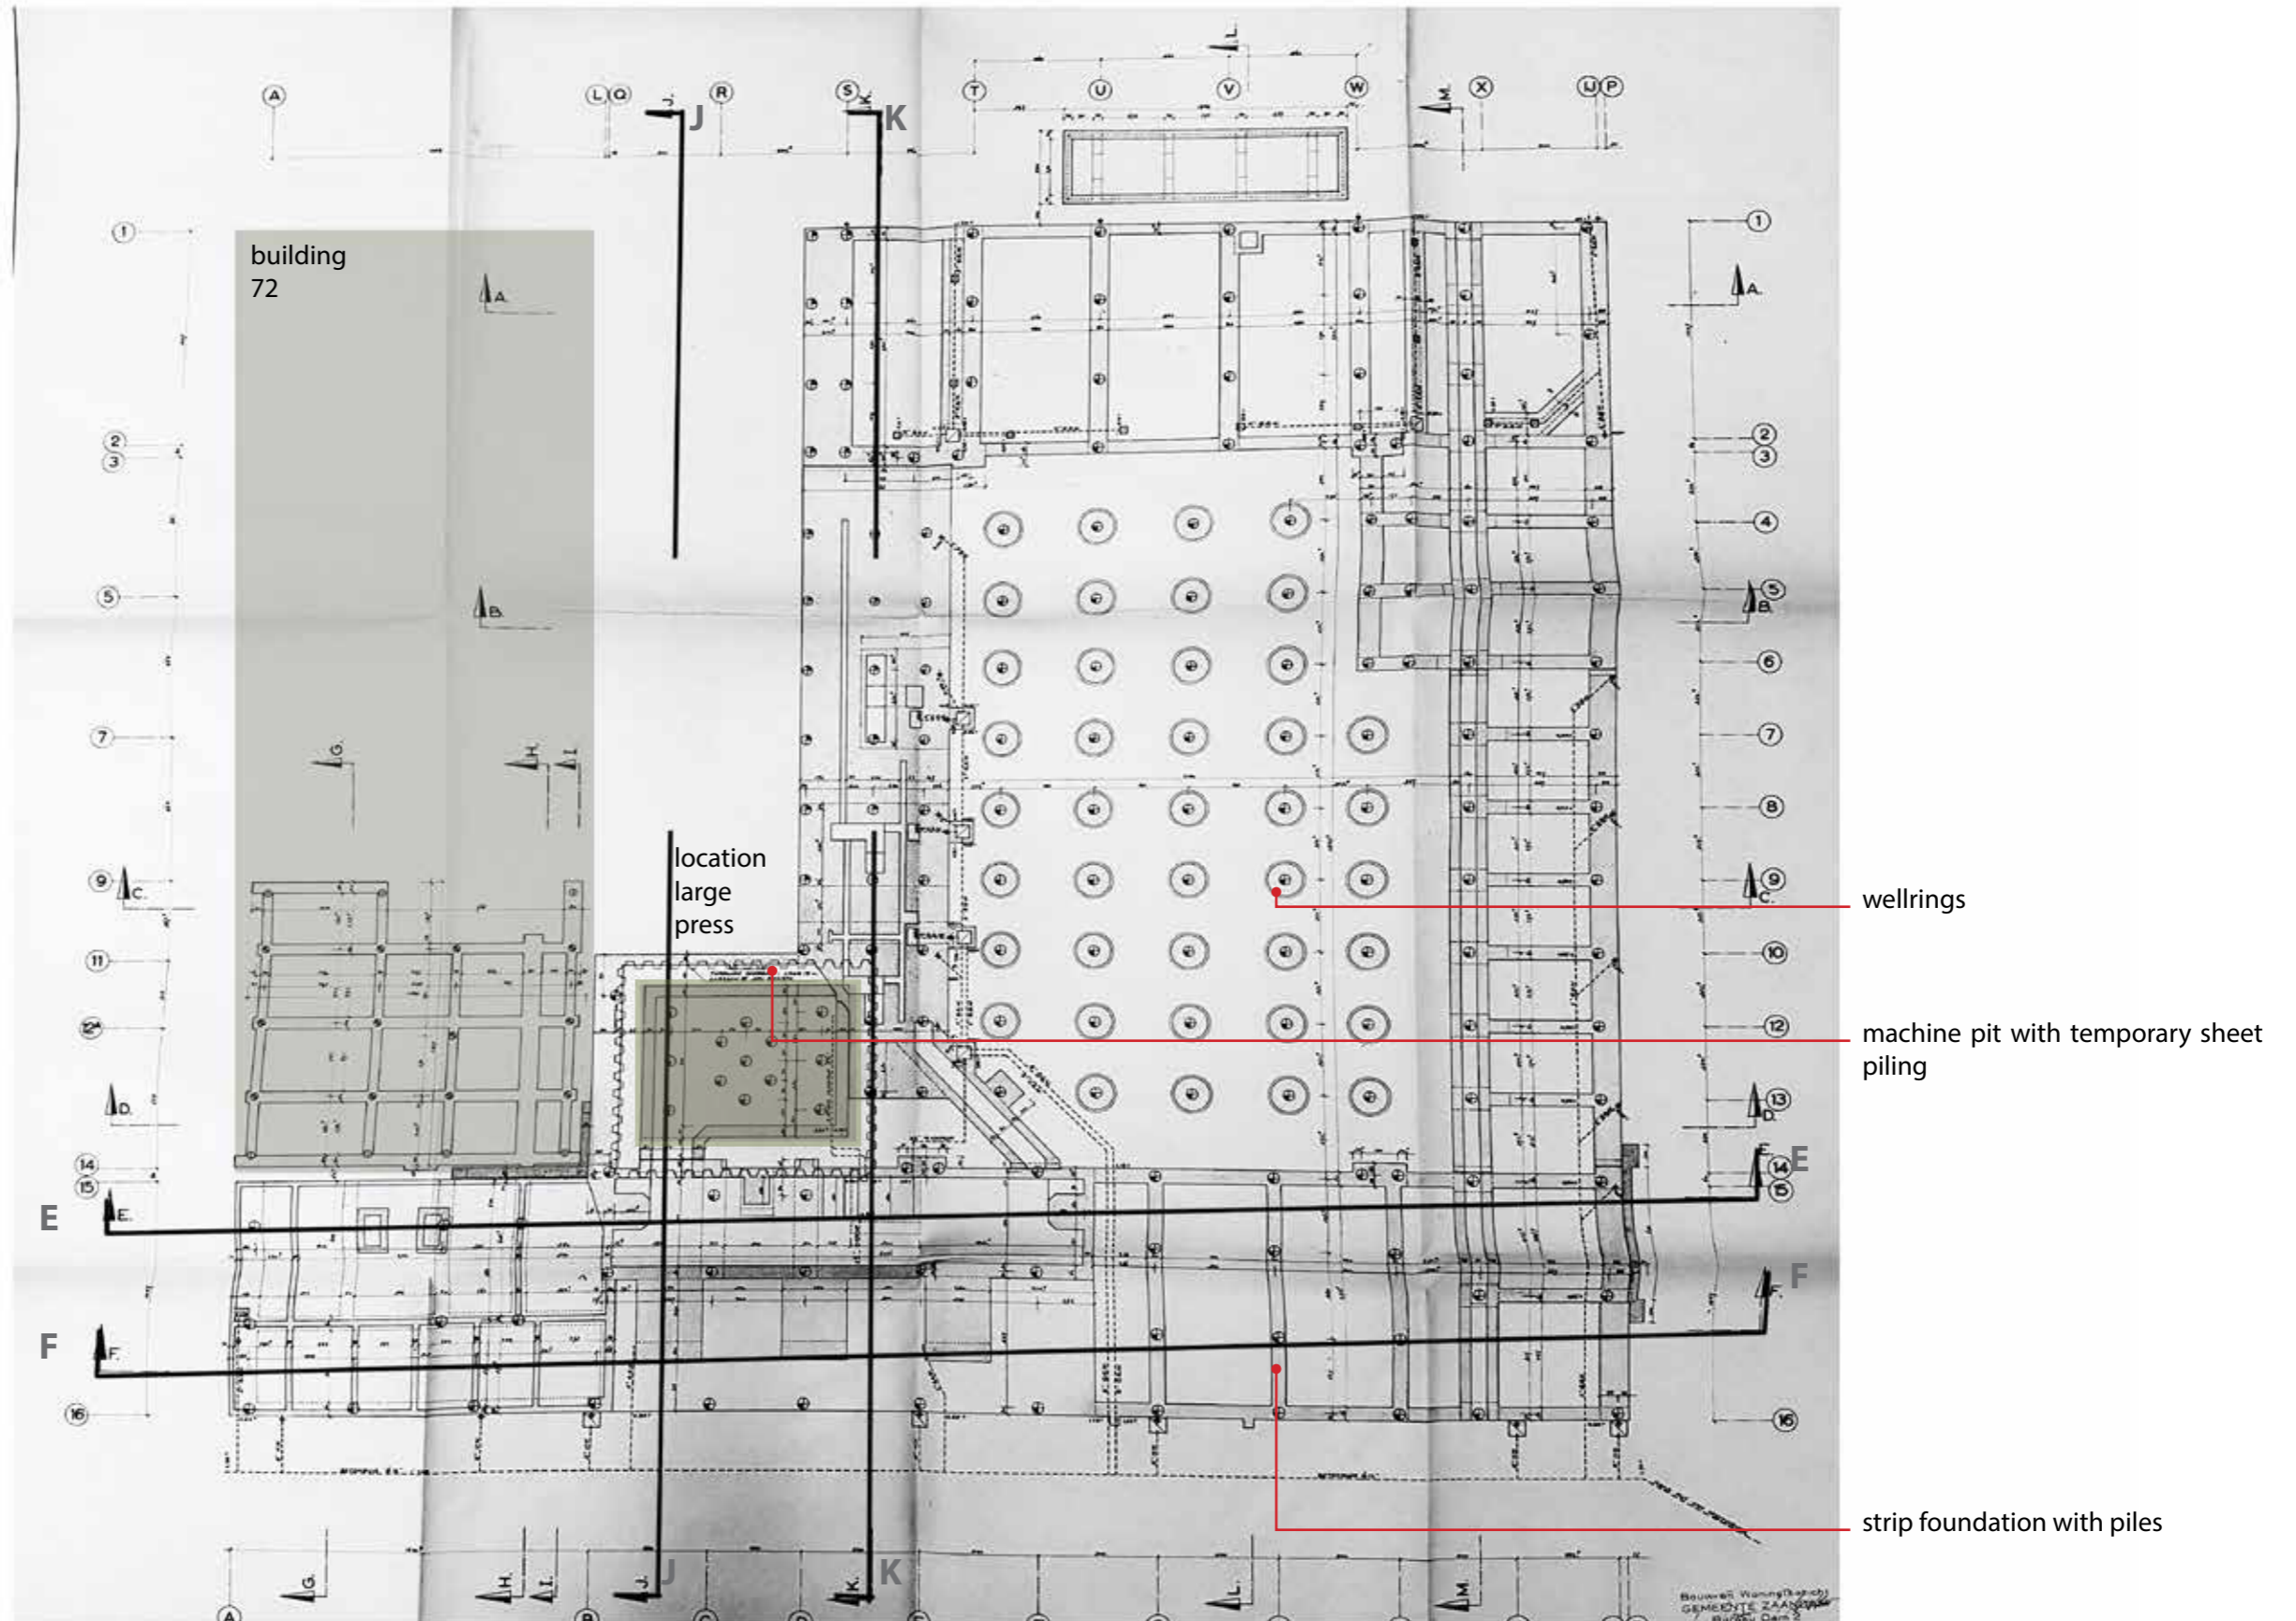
foundation drawing building 436 (Archief Zaanstad)
